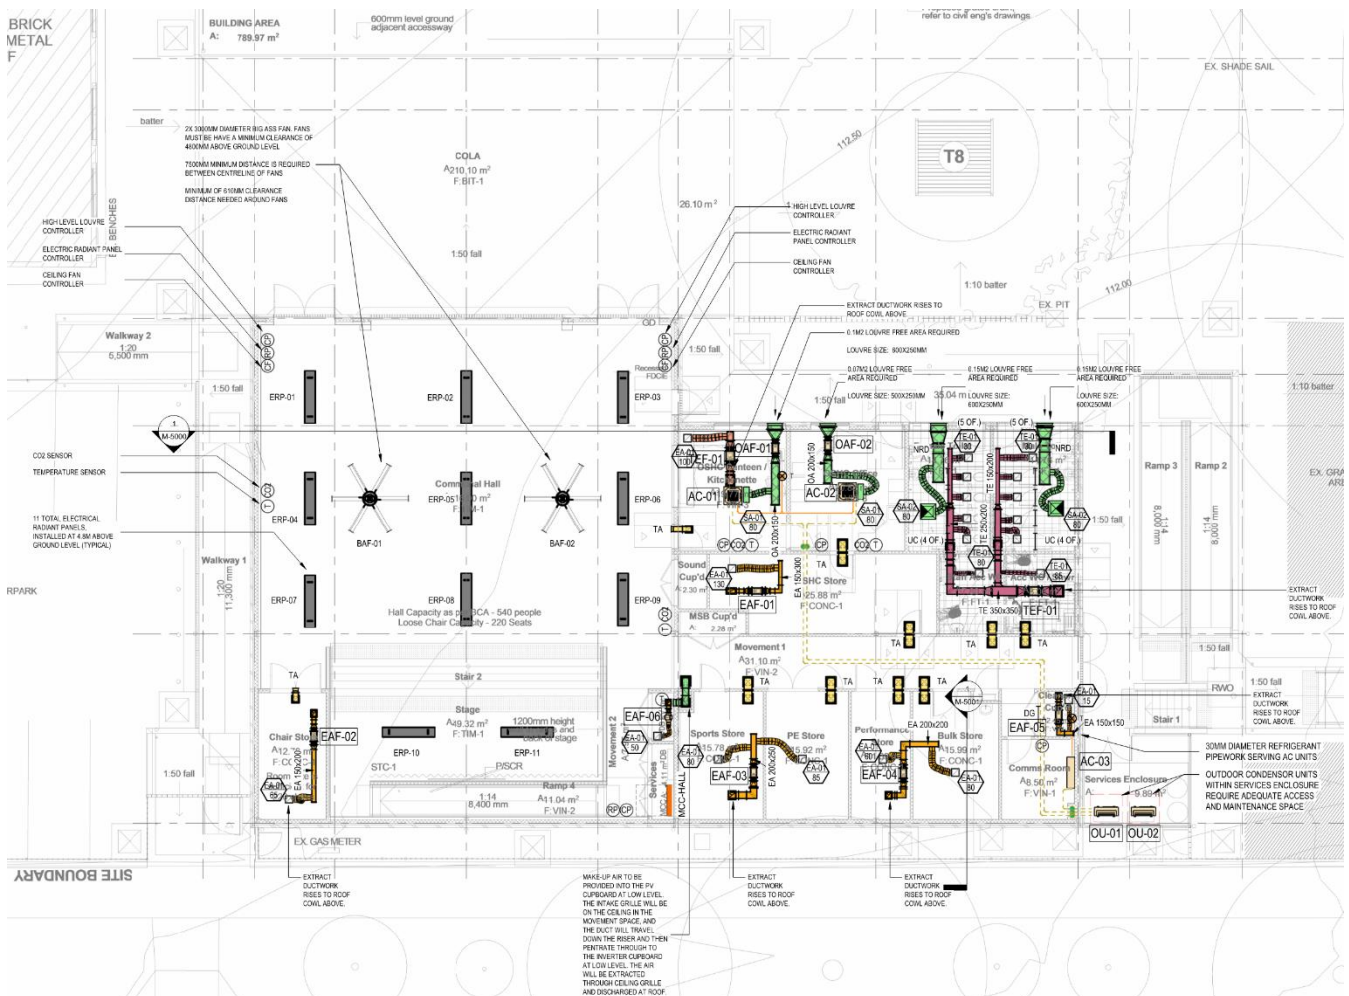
Schematic Design (SD) mechanical layout for the proposed Hall (Source: Steensen Varming)
